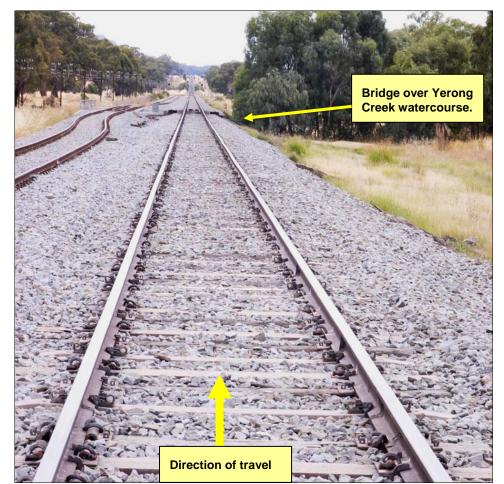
Lowest point at Yerong Creek station, to the north of misalignment
